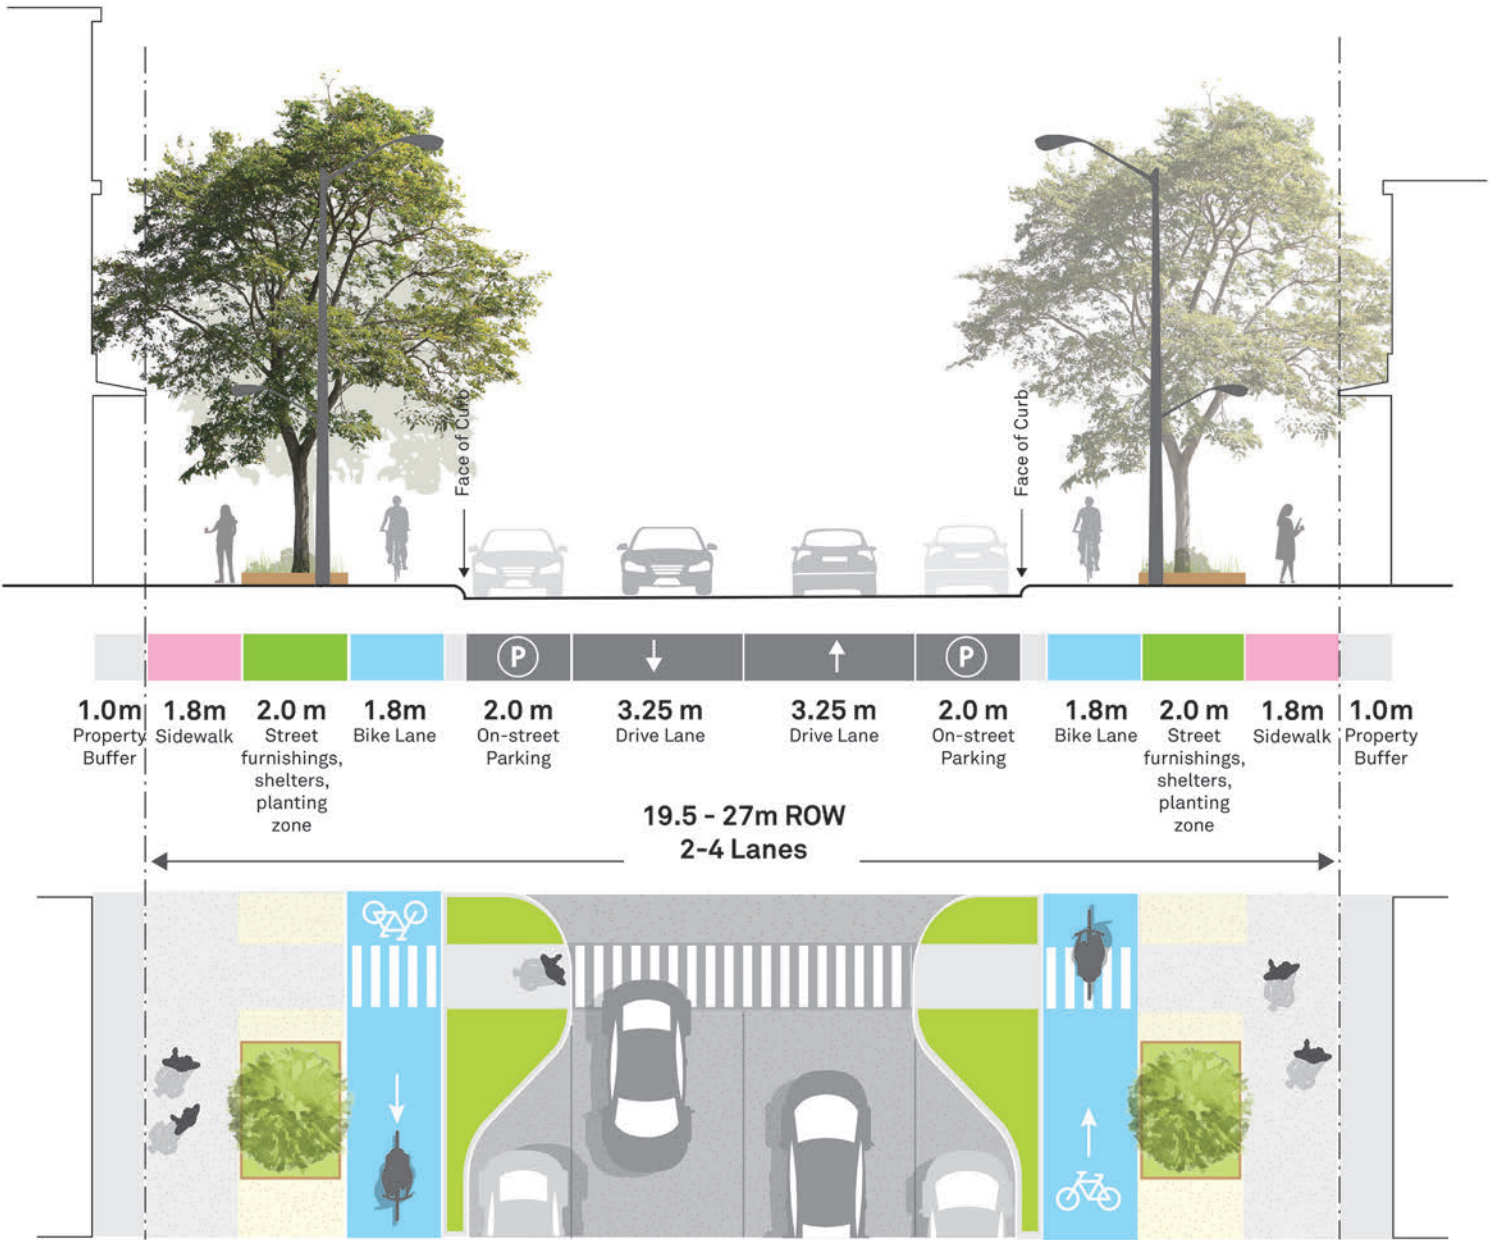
Sample section for a Municipal Collector Street in a Main street configuration with curb bump-outs that help shorten the crossing distance for pedestrians.
